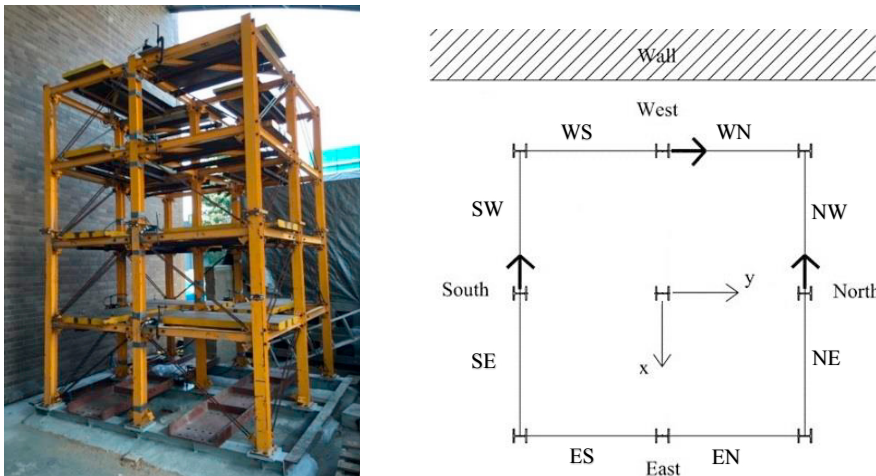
Steel frame structure: (a) photo; (b) schematic plan-view and layout of the sensors at each story
